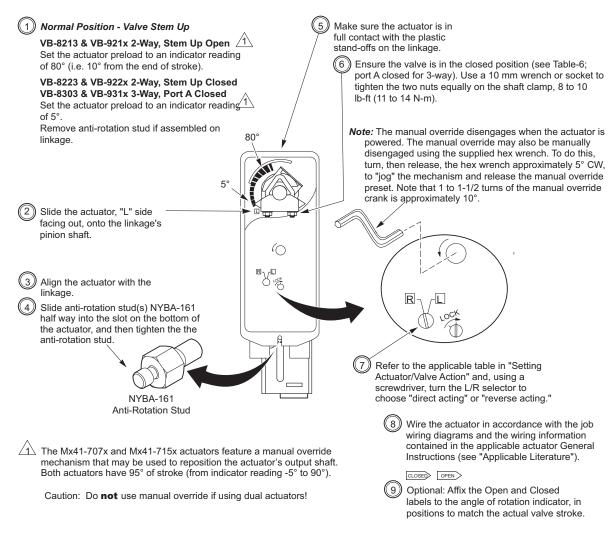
Mounting Mx41-707x or M41-715x and Setting Up Actuator/Linkage/Valve
